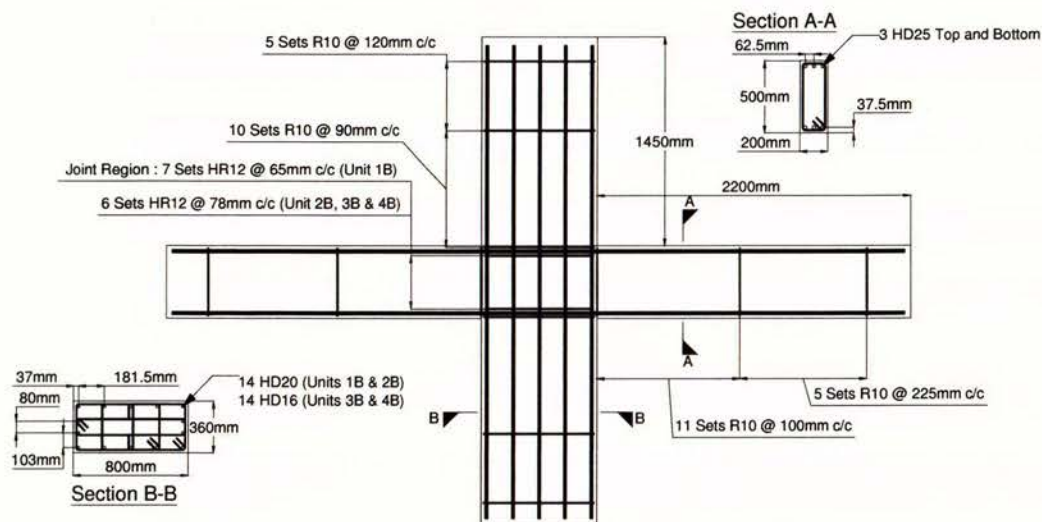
Typical reinforcement detailing, units 1B-4B
